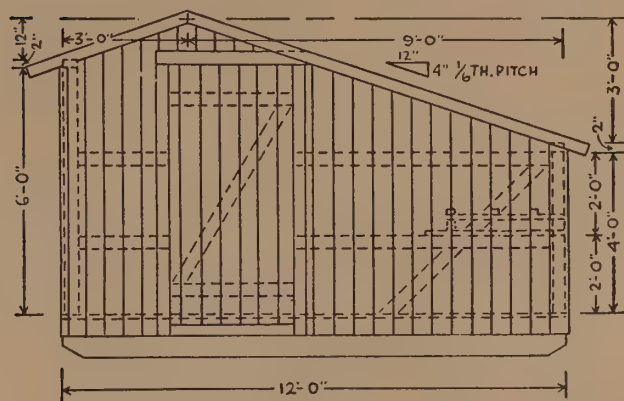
Side view showing framing, roosts and dropping boards. Insulation board can be used for the siding
